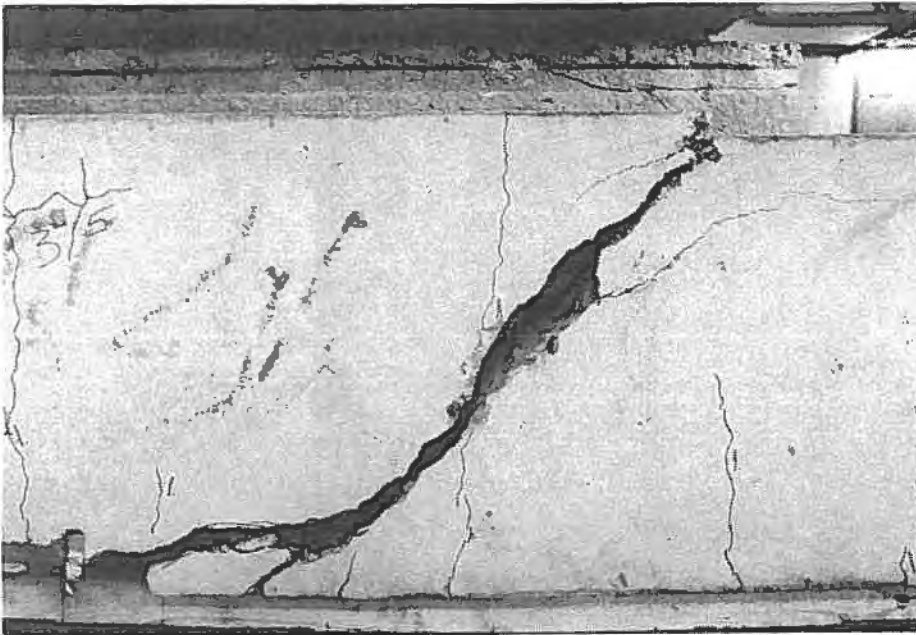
Shear failure in a shear reinforced part of a beam, but with no failure of the stirrups.
